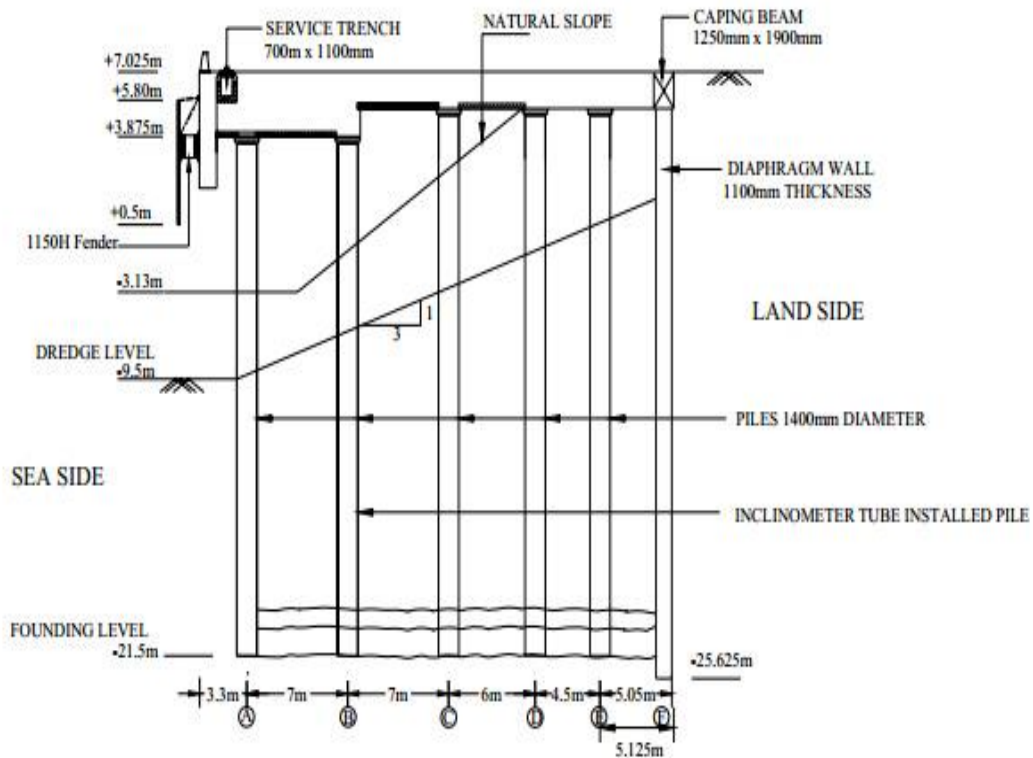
Cross-section of berthing structure with diaphragm wall 1 at JNPT, Mumbai
